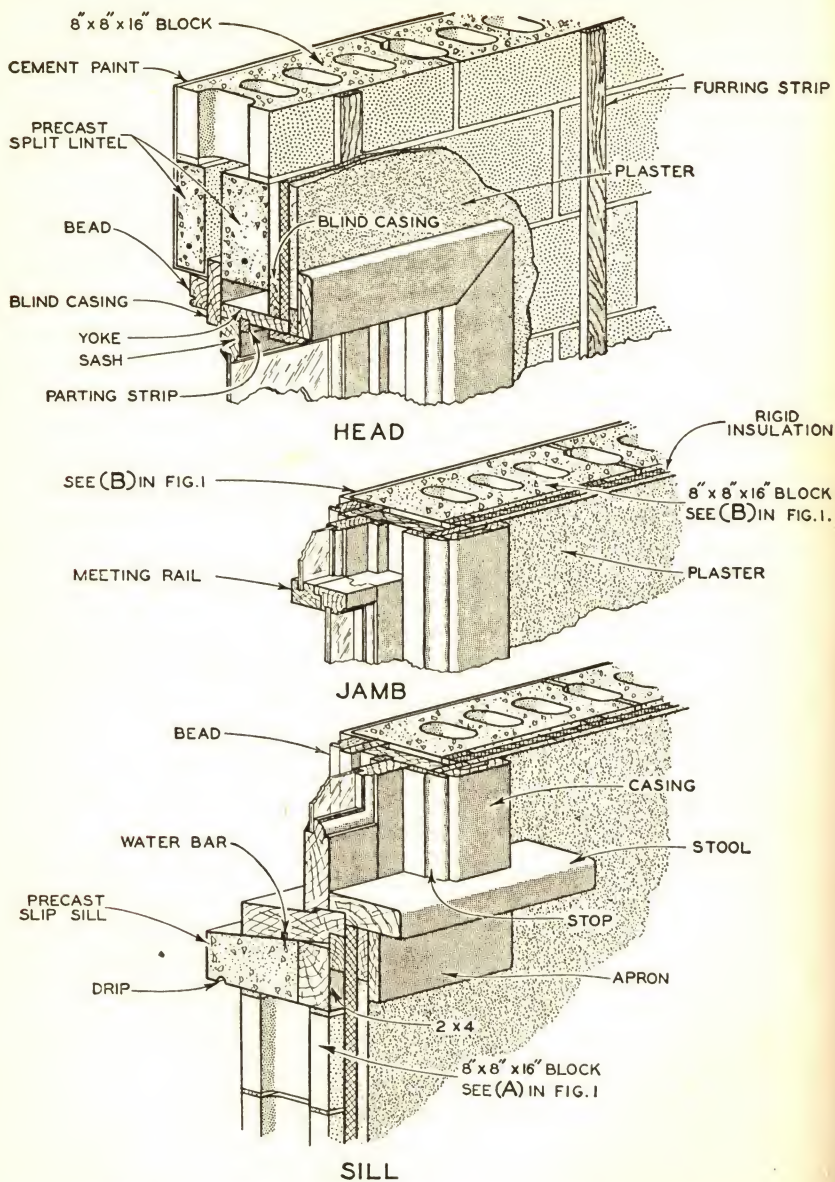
B. Double-Hung Wood Sash Windows in Concrete Masonry Walls
